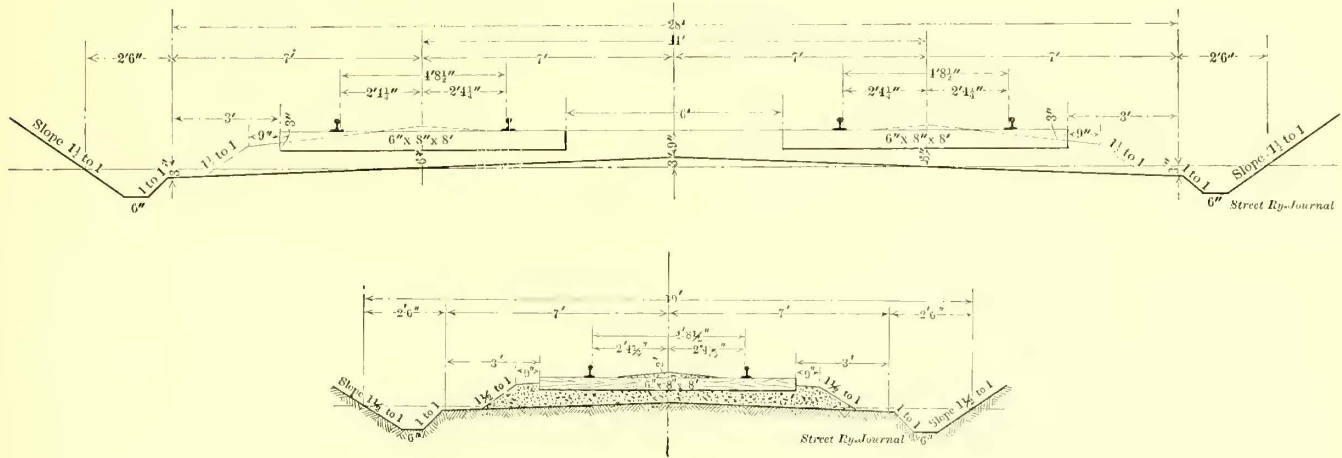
PLAN OF STANDARD ROADBEDS ADOPTED BY THE OREGON WATER POWER & RAILWAY COMPANY
